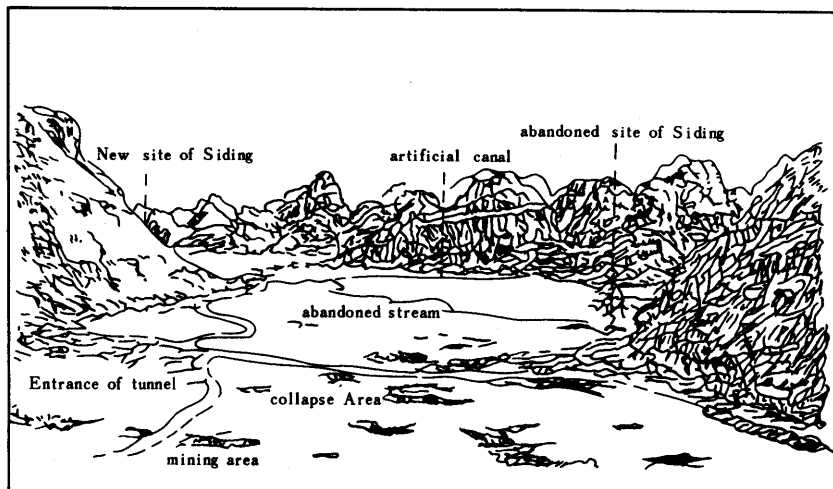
Sketch showing surface collapse in Siding mining area, Guangxi.
